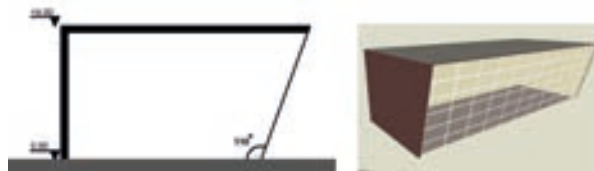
Schematic Section Figure 1.3b 3D Model of Building
